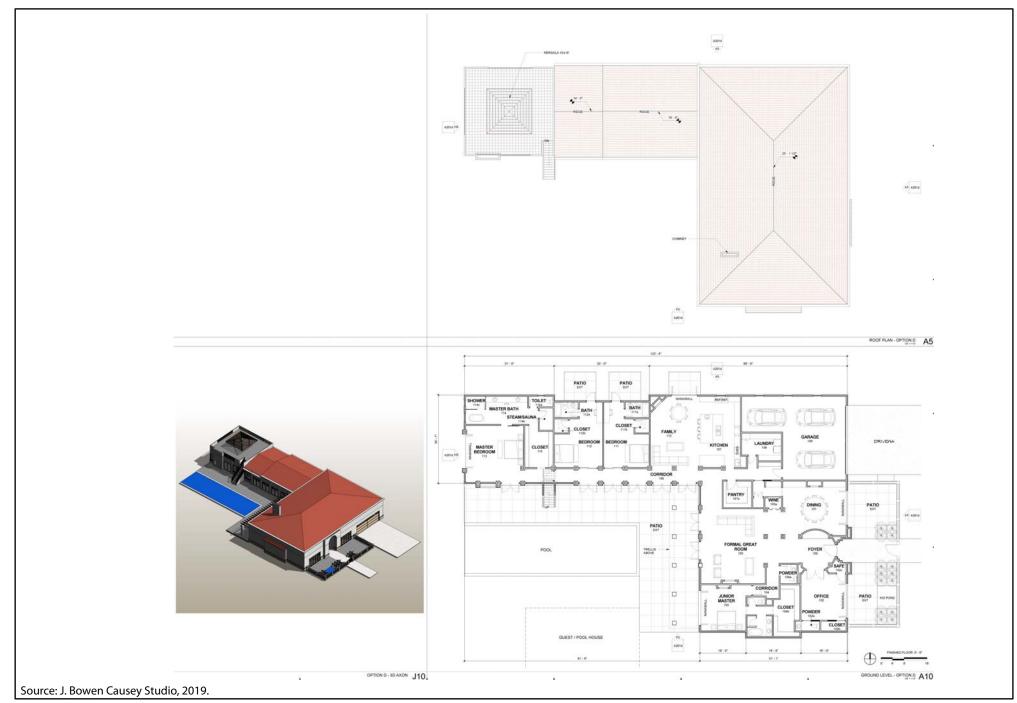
Option D(1) - Floor Plans and Roof Plan
